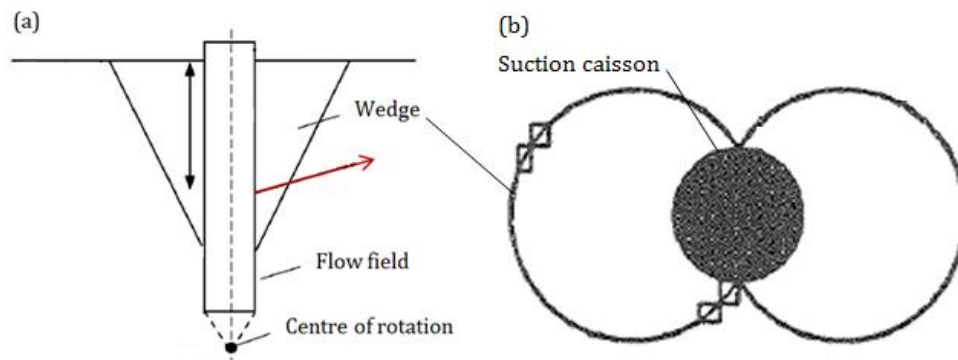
Soil failure mechanism under inclined loading: (a) elevation, (b) in-plane views [67]
